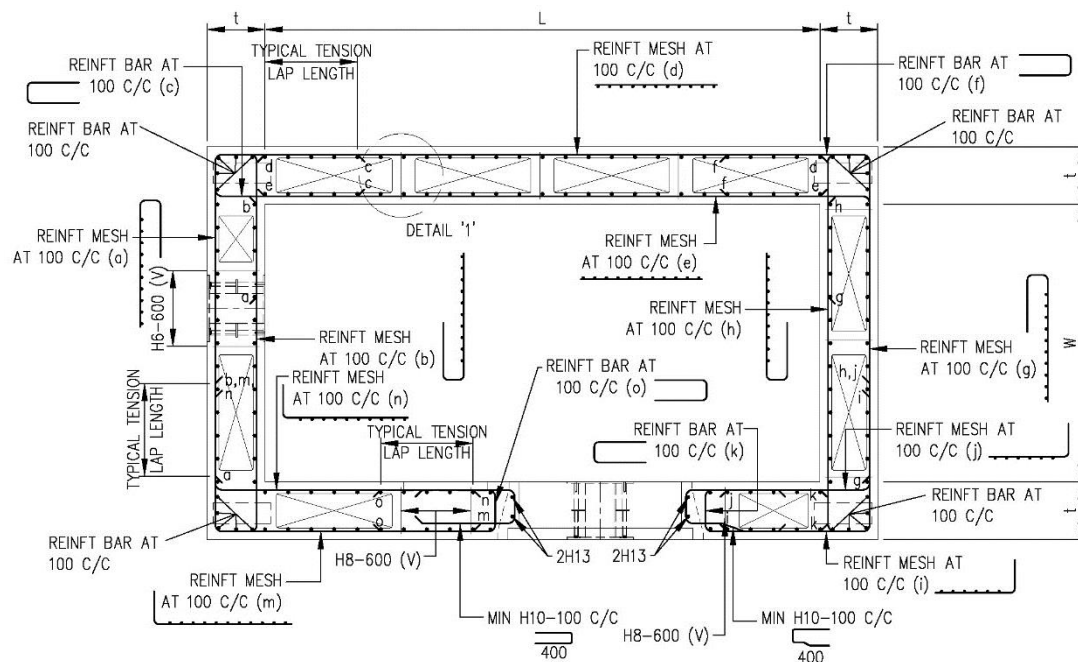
(iv). PRECAST HS AND C-SHAPED PRECAST HS CONNECTED AT THE LONGER WALL AND WITH HS DOOR EACH ON LONGER WALL AND SHORTER WALL (TYPE 5A)
